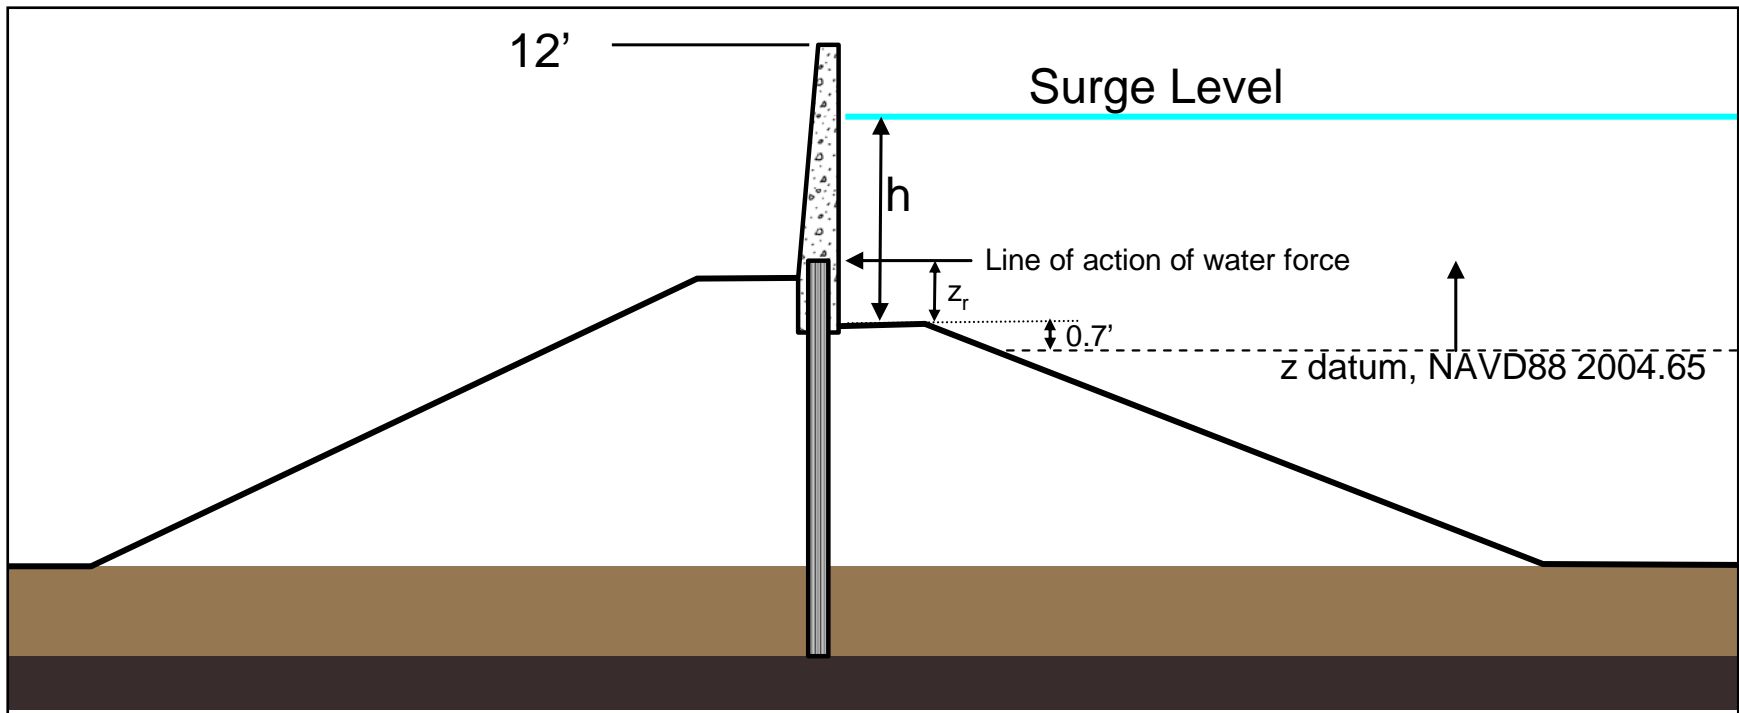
Cross-sectional schematic for 17th Street Canal walls near failure location
